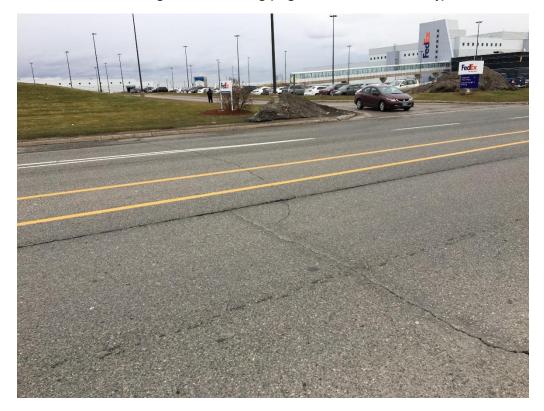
Transverse and Longitudinal Cracking (Low to Moderate Severity)-Bramalea Road WB
